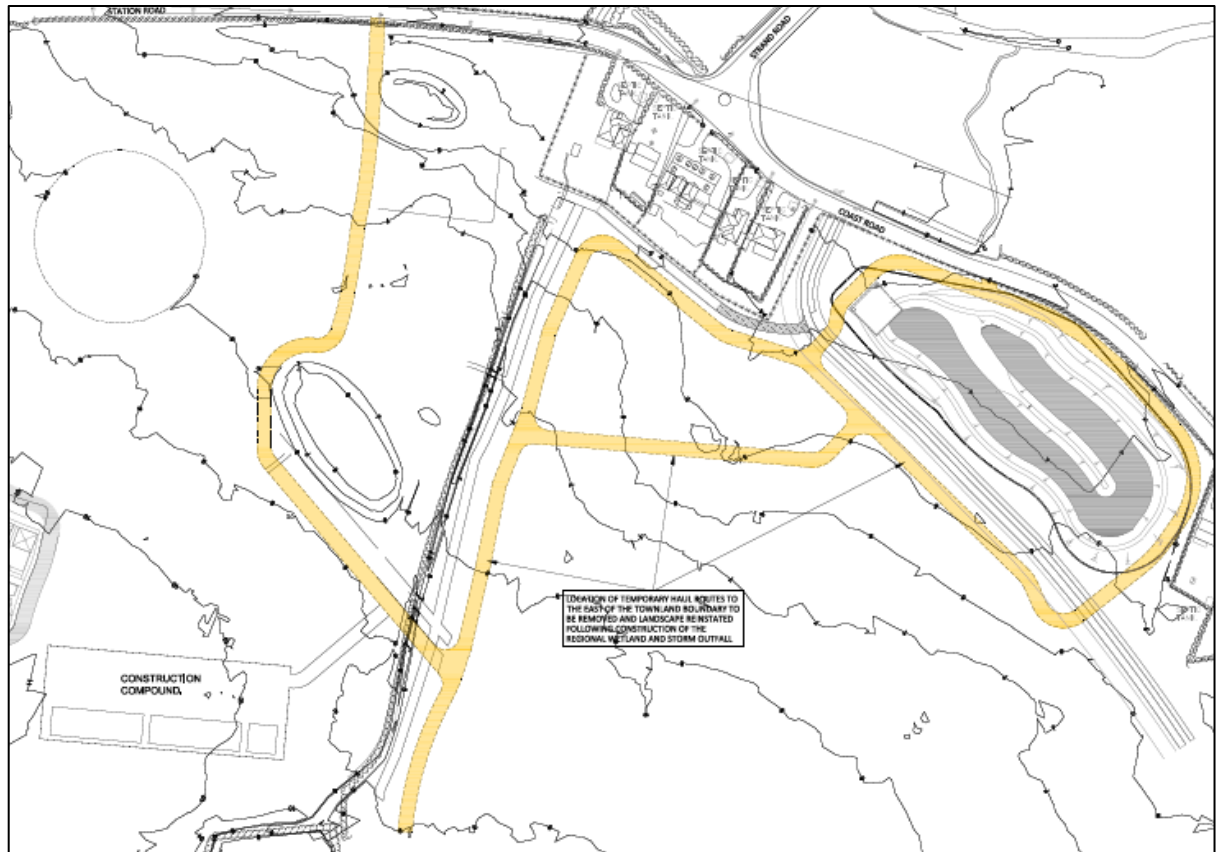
Shows the location of the proposed construction compound and temporary haul roads, this will be test excavated in advance of construction (after J.B.Barry)
